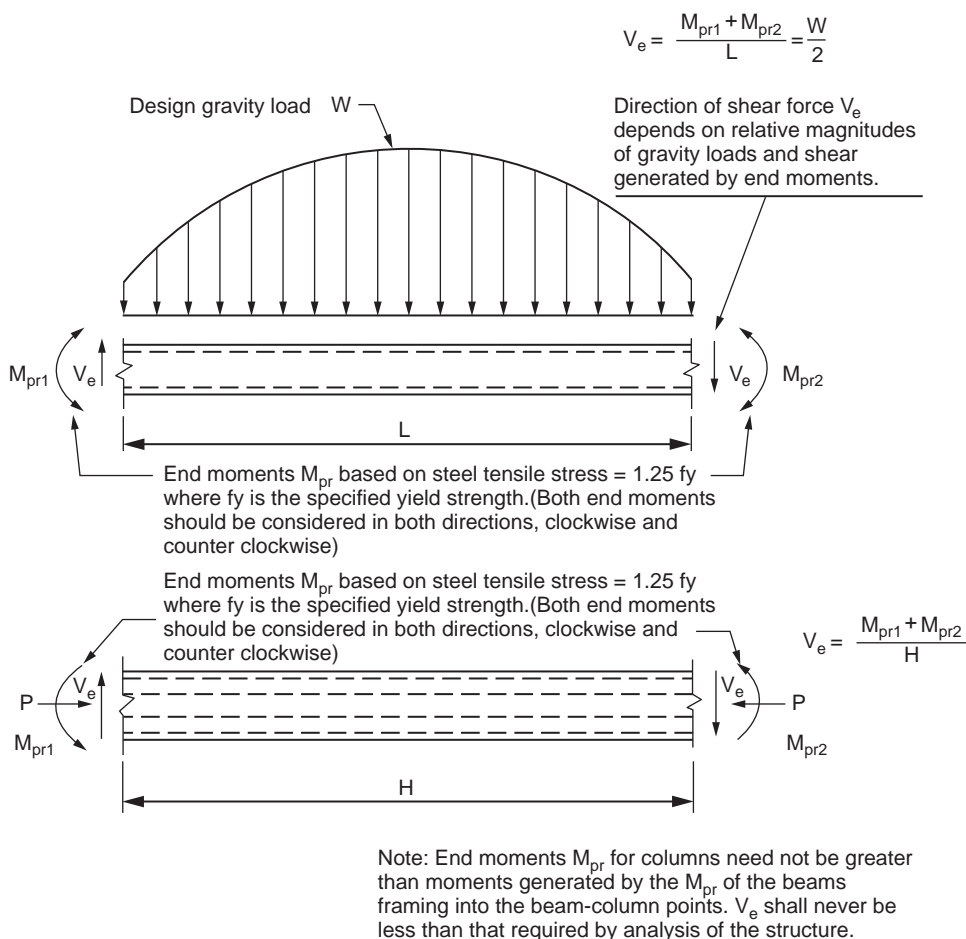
Design shears for girders and columns. (Source: ACI 318, 1992.)
